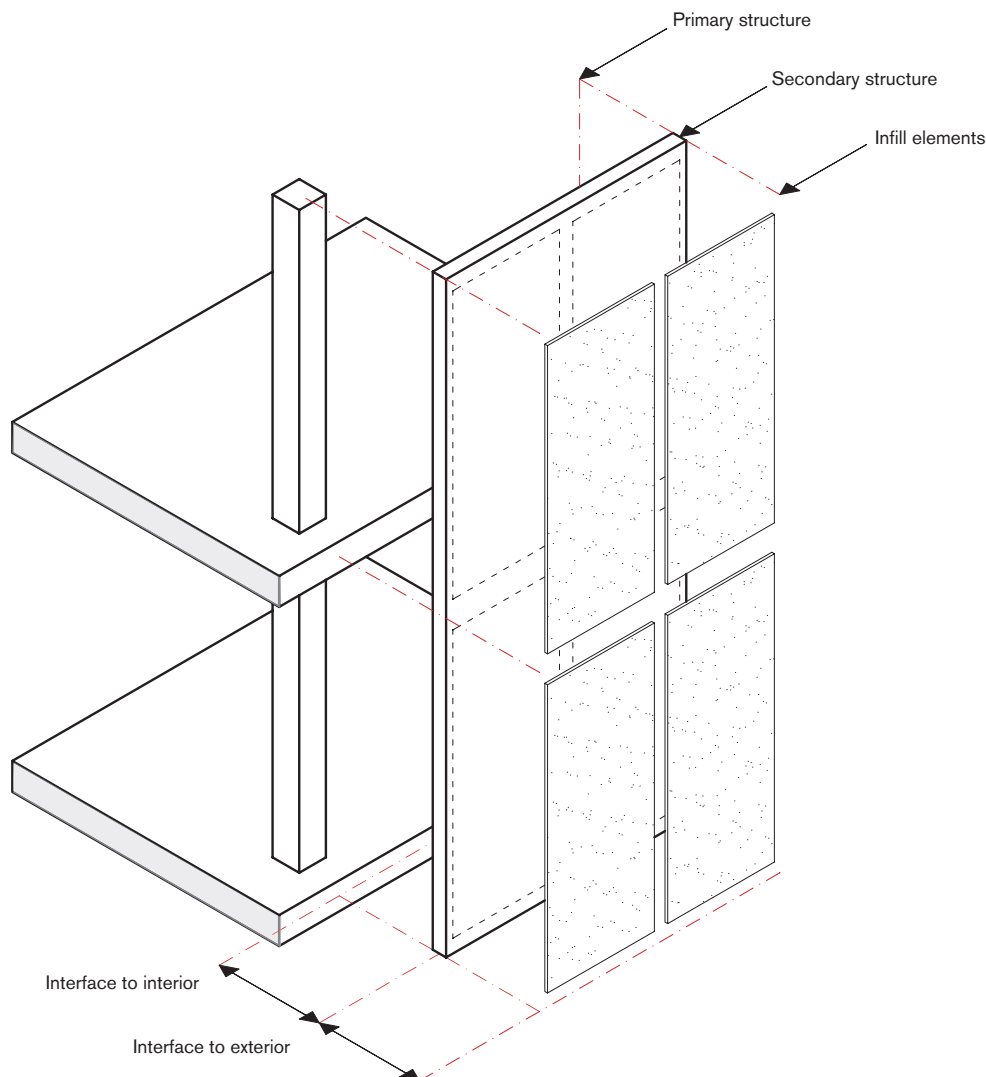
Main areas of construction of a façade. Image by Knaack et al. (2007).
